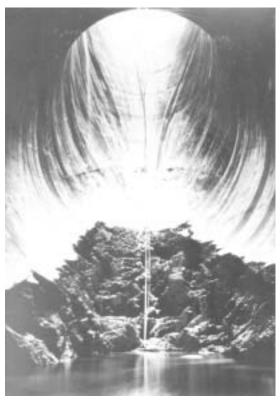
Eroded area in spillway tunnel at Hoover Dam, 500 ft (152 m) below crest, before repair with PA concrete.
